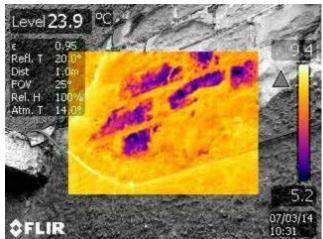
Cold Bridge introduced at area of spalled render.
